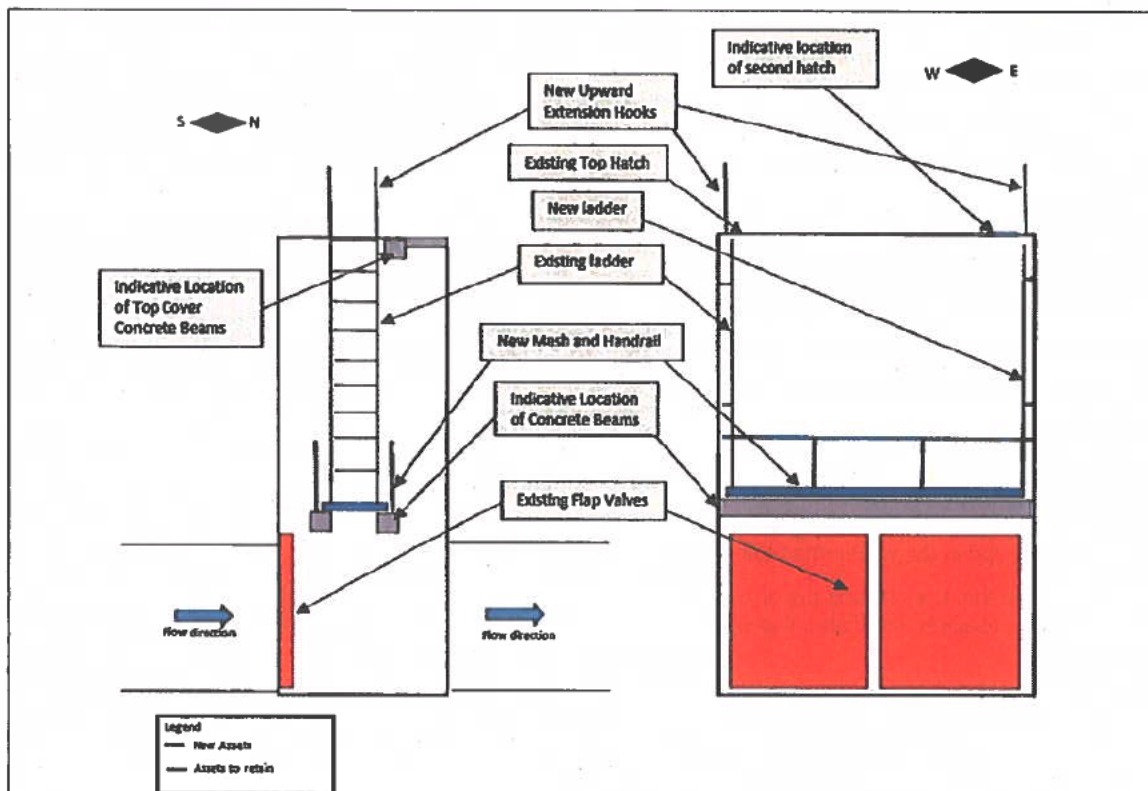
Pevensey West Outfall - Outer chamber (Open Channel). Conceptual arrangement sketch (cross section and elevation)
